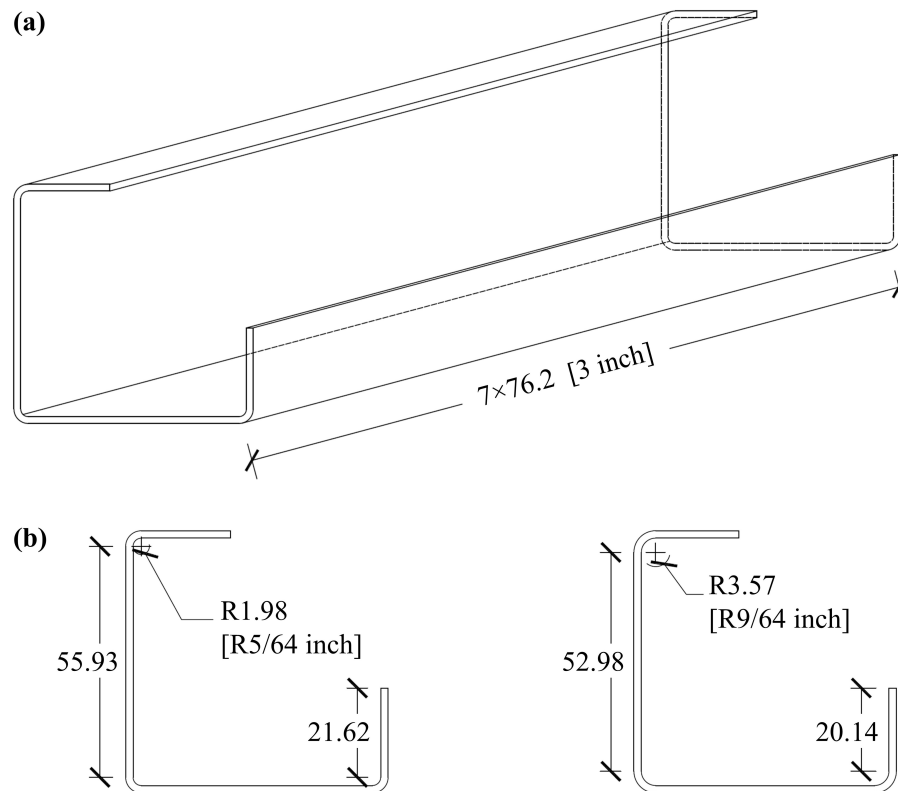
Design dimension of the angle section (in mm if not specified).
